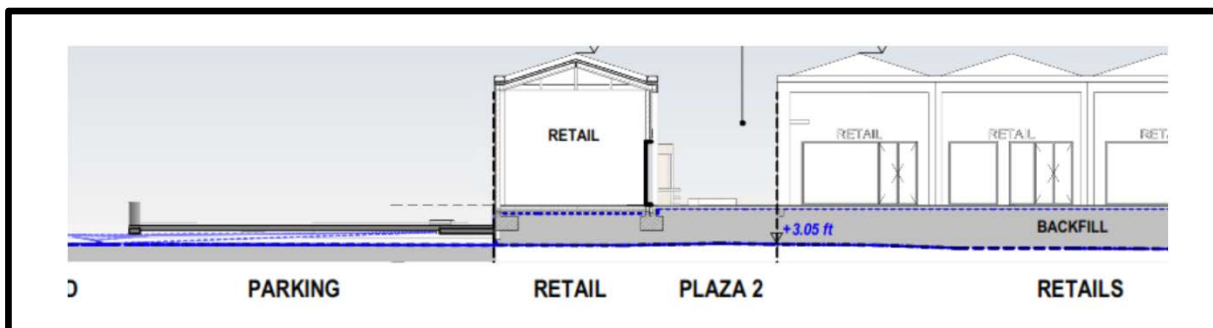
Section B showing the required fill between existing ground level and elevation of the pavement
